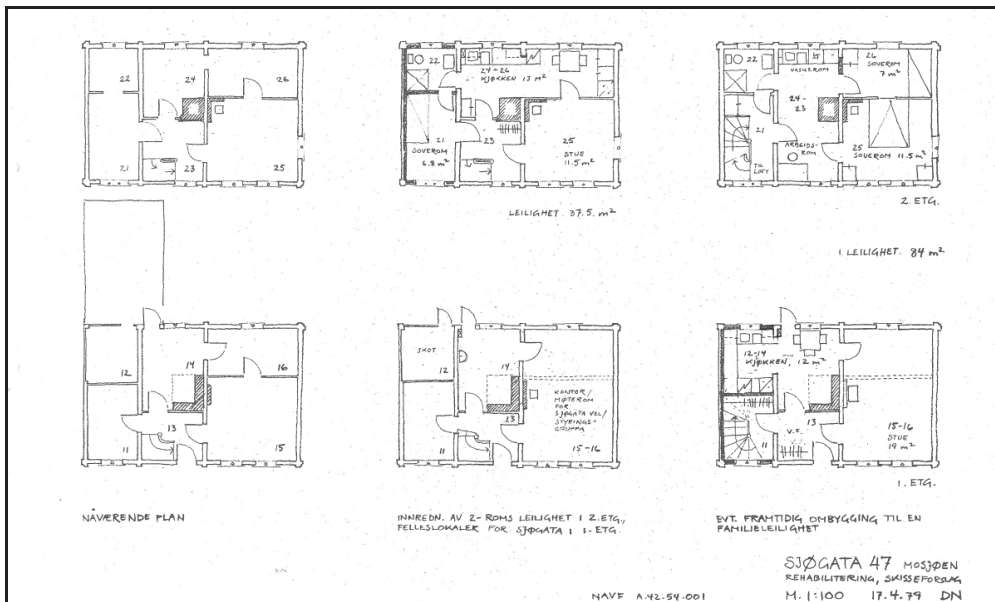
Sjøgata 47, existing situation (left), plan for upstairs apartment and downstairs common room (centre), and alternative plan allowing for future conversion to family apartment. Dag Nilsen 17.4.1979, NAVF project, original scale 1:100. (Dag Nilsen private archive)
